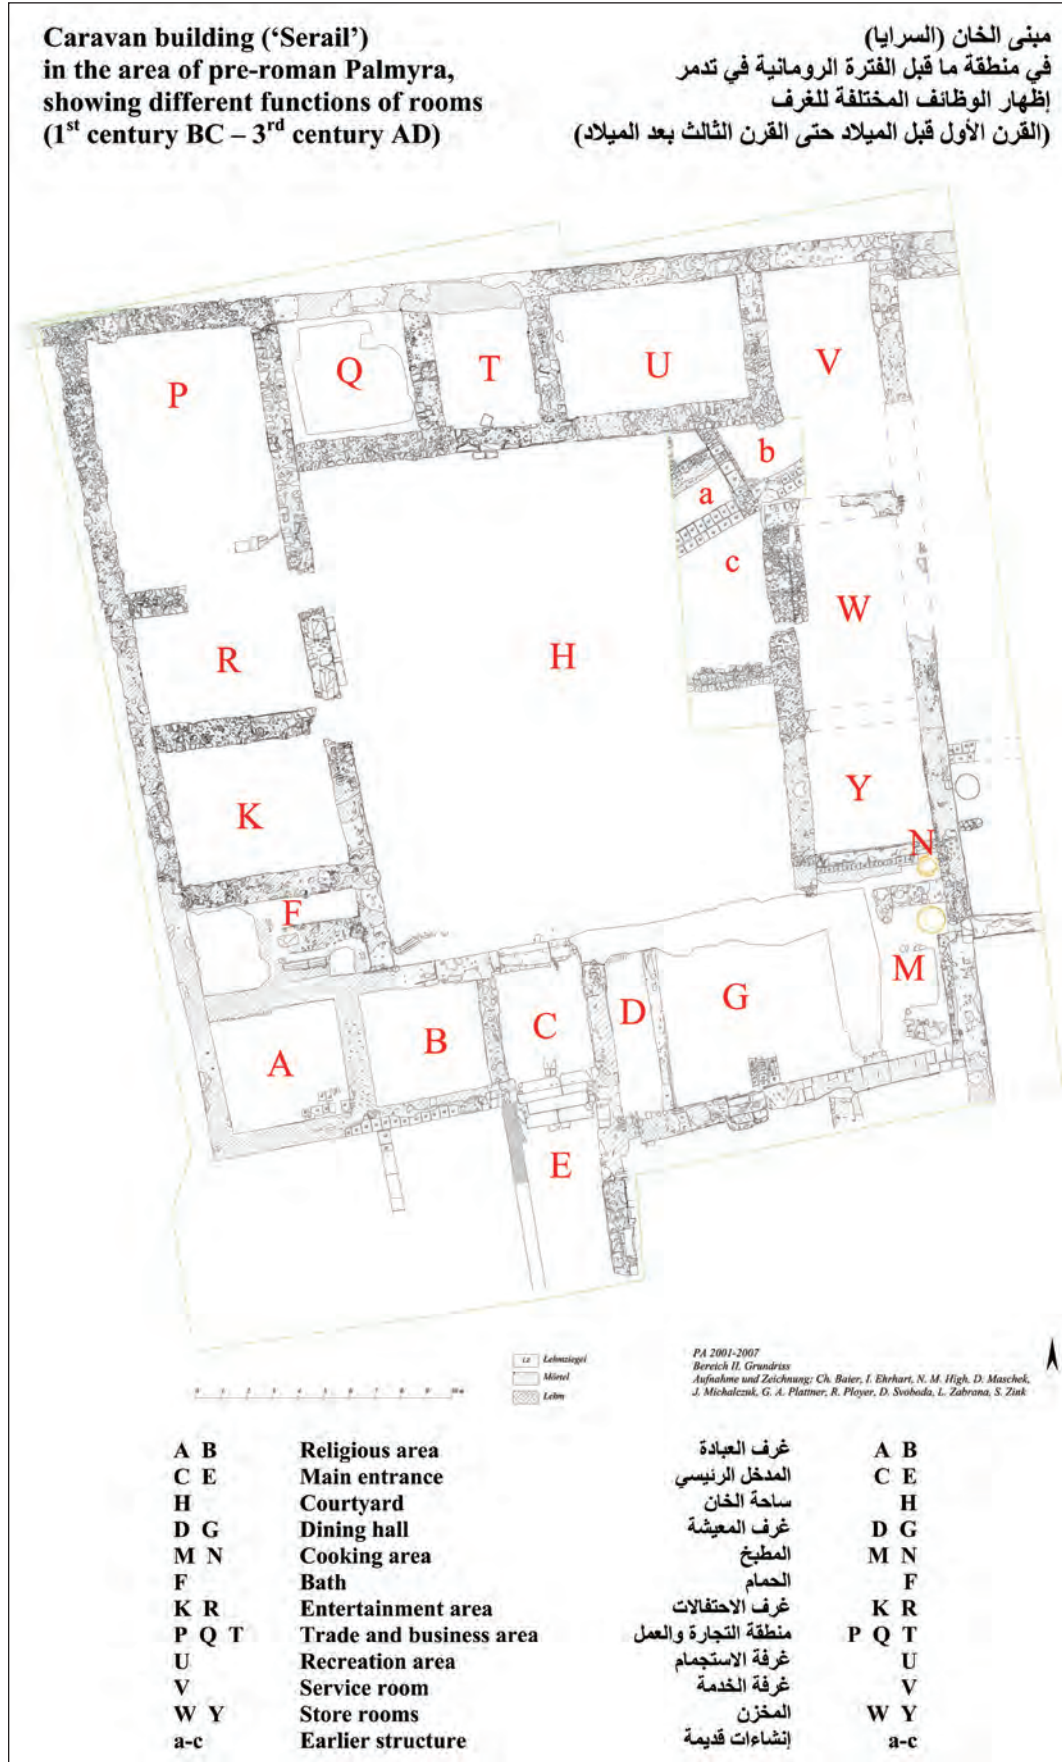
Caravan Building ('Khan'), Ground Plan.
